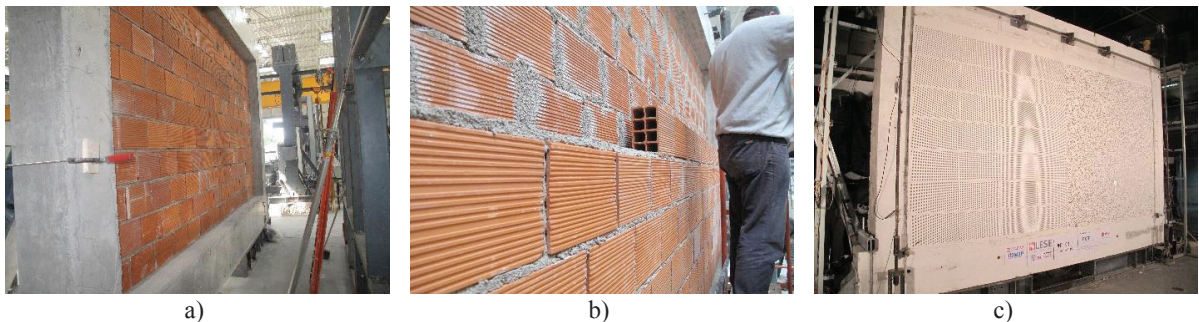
Infilled RC frame specimen: a) 150mm thick panel construction, b) 110mm thick panel construction and c) experimental test apparatus.
